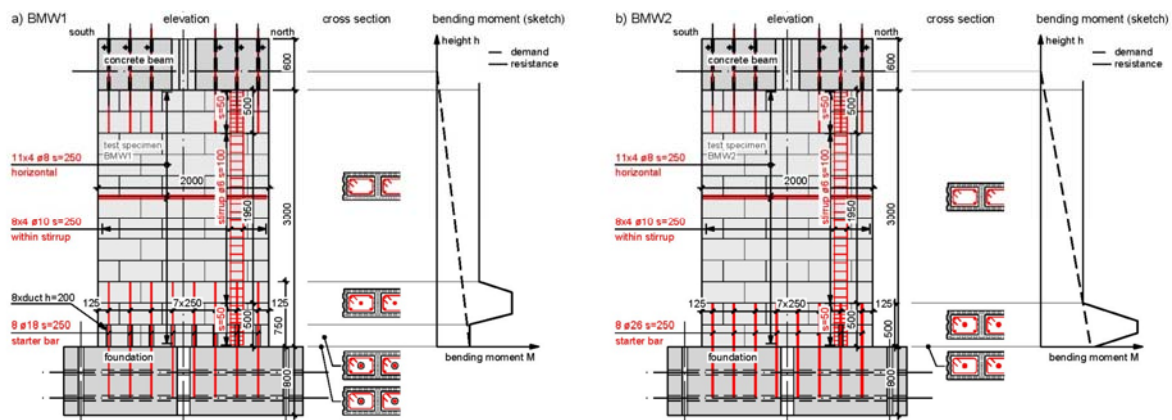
Elevation, cross section and sketch of bending moment demand and resistance for Test Units BMW1 (a) and BMW2 (b).
